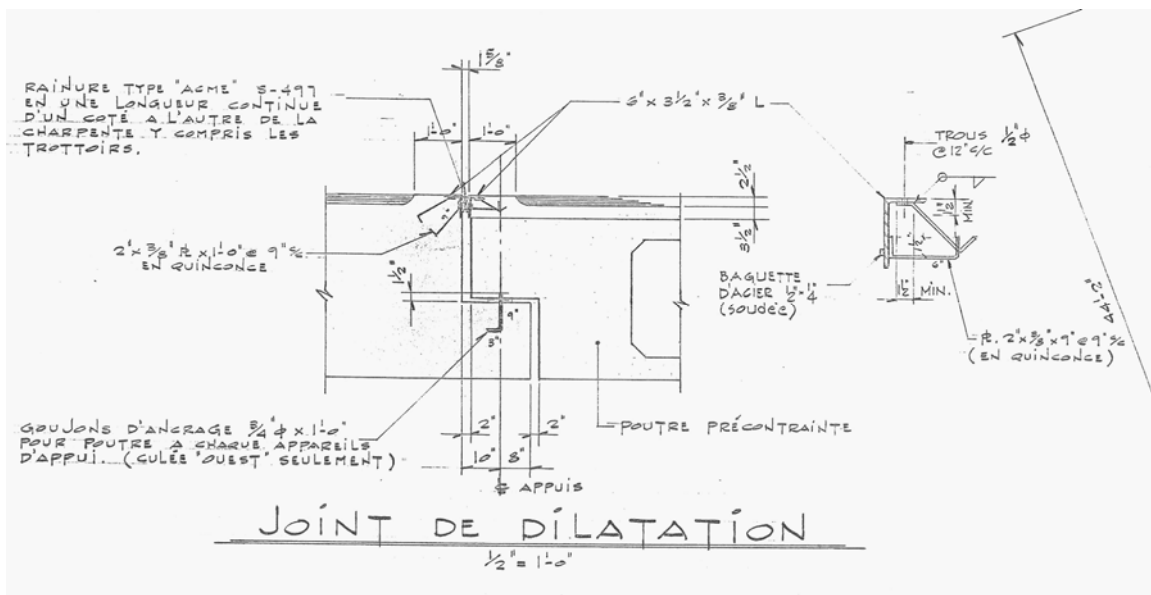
Details of pins and expansion joint reinforcement after revisions
